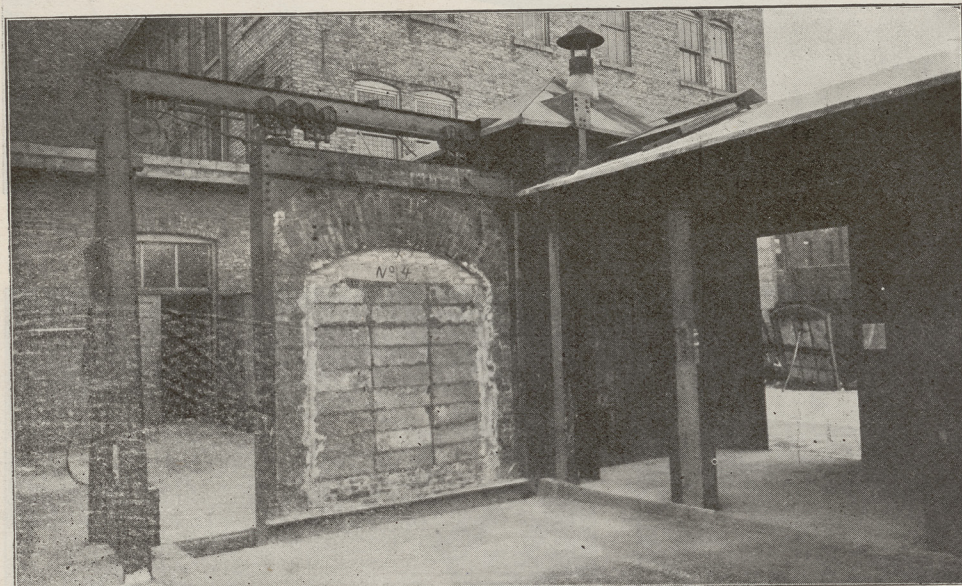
TESTING FIRE-PROOFING QUALITIES OF CONCRETE.
